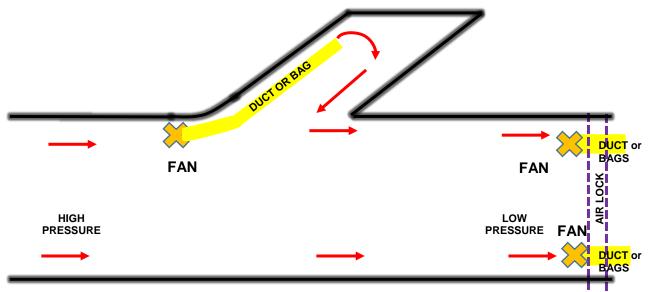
Example layout of a Longitudinal Ventilation System with Exhaust Fans
